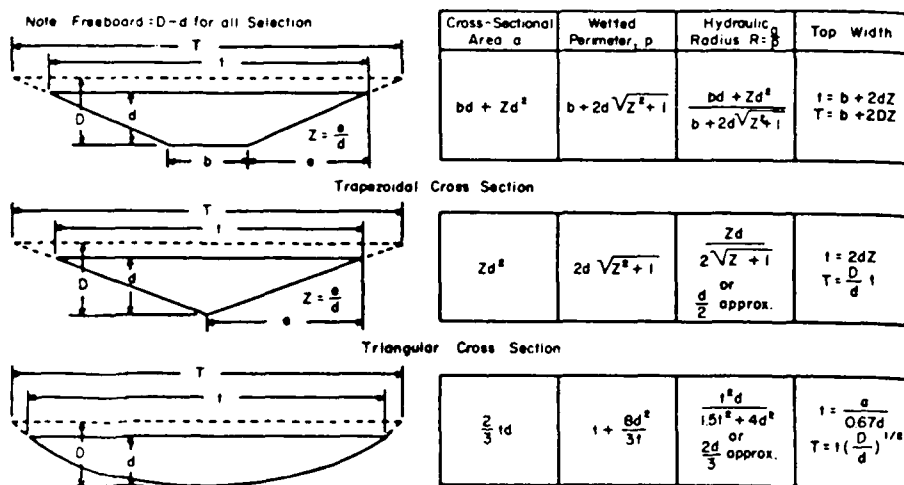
Properties of typical channel cross sections (Haan and Barfield 1978)
